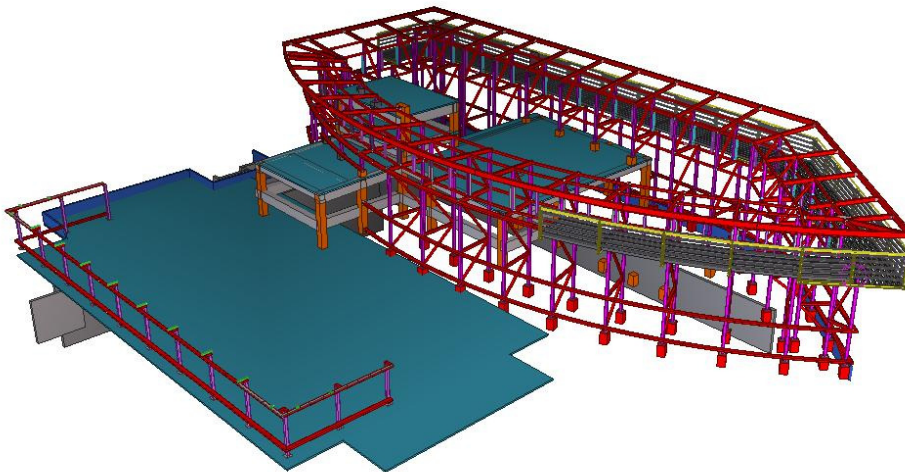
BIM Model of Midtown Atlanta Office Building (Kelley 2009)
